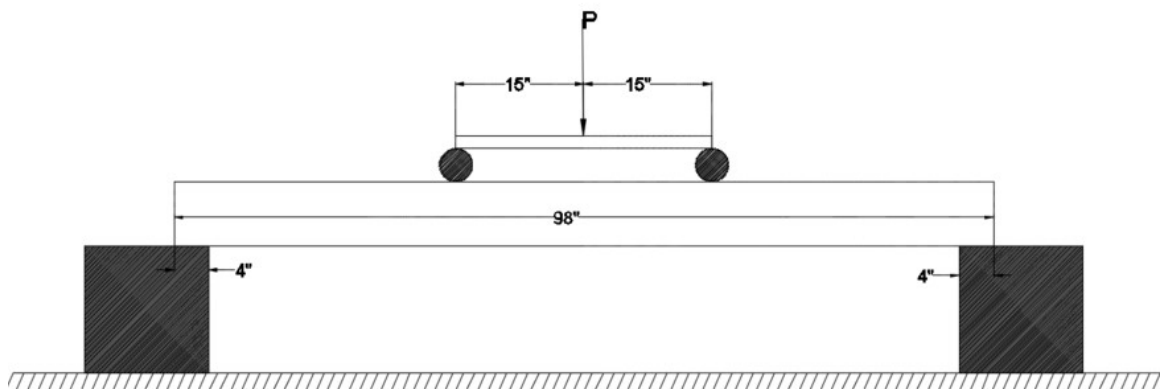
Slab Flexural Test Set-up for 2.4m (8ft) Long Specimens
